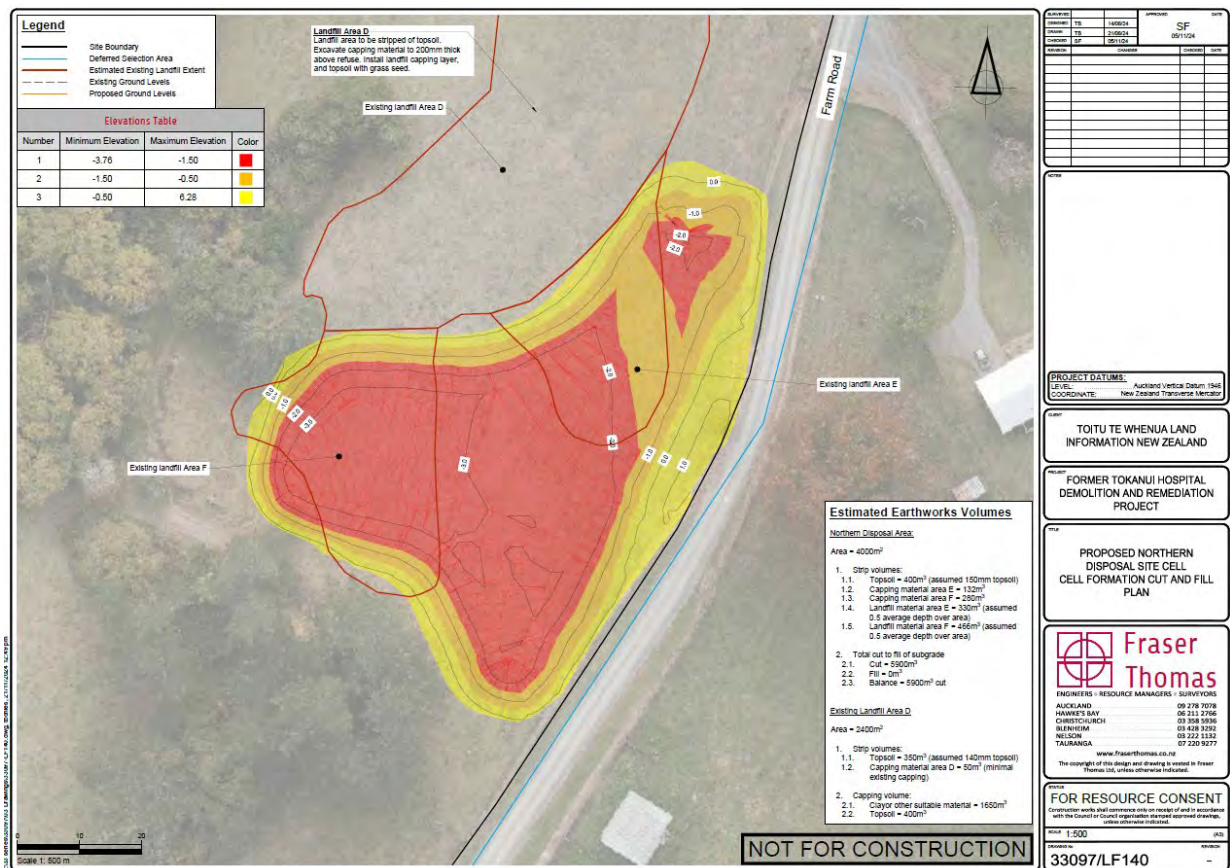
Proposed Northern Disposal Site Cell – Cell Formation Cut and Fill Plan
